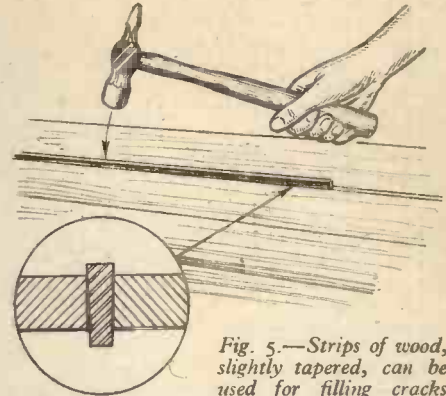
Strips of wood, slightly tapered, can be used for filling cracks between floorboards. Hot glue is applied to the strips before hammering them in place.
